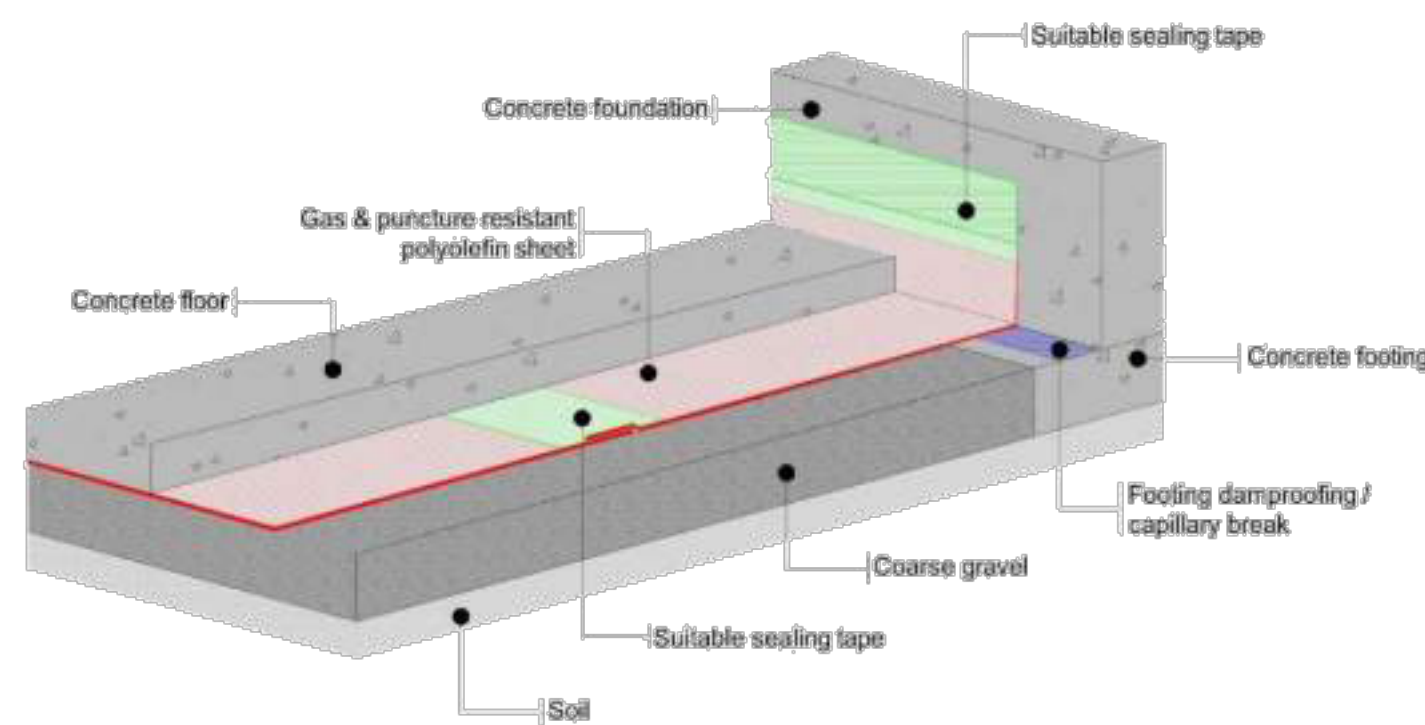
Sealing sub-slab membrane vertically to concrete foundation wall
